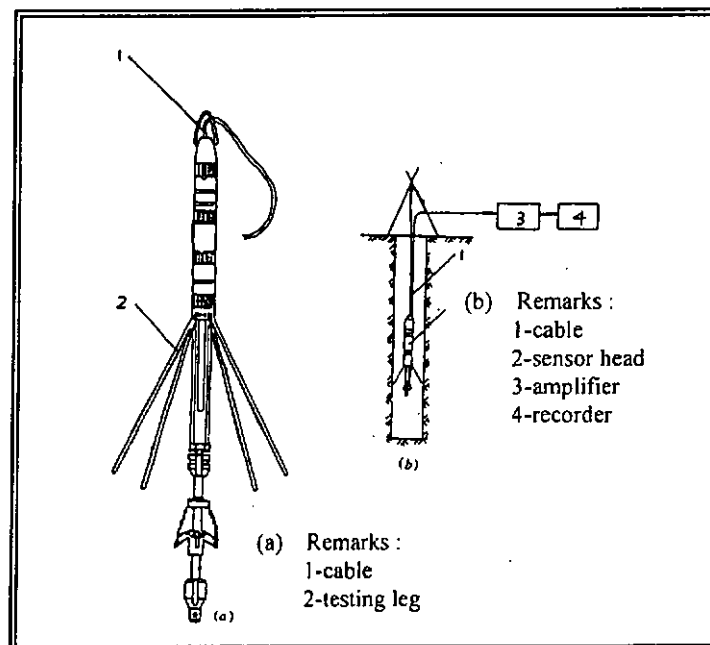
Diameter measurement equipment (b) with enlargement of diameter measurement sensor in (a).
